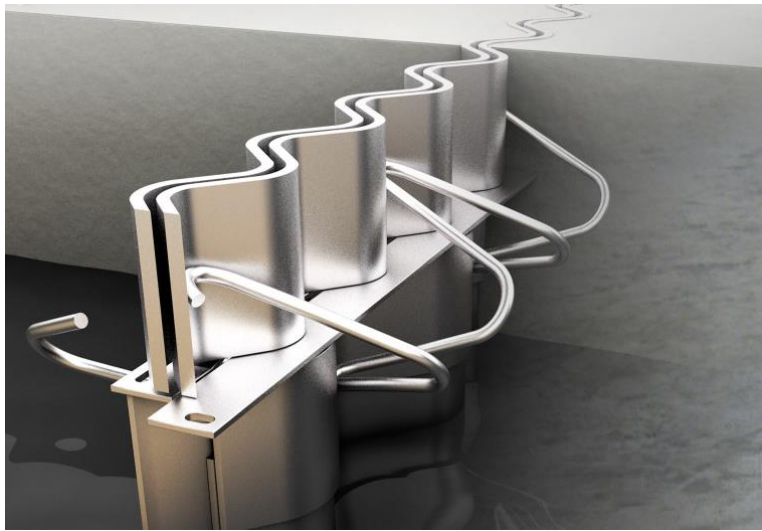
Cosinus Slide Joint (Hengelhoef Concrete Joints, 2018).
